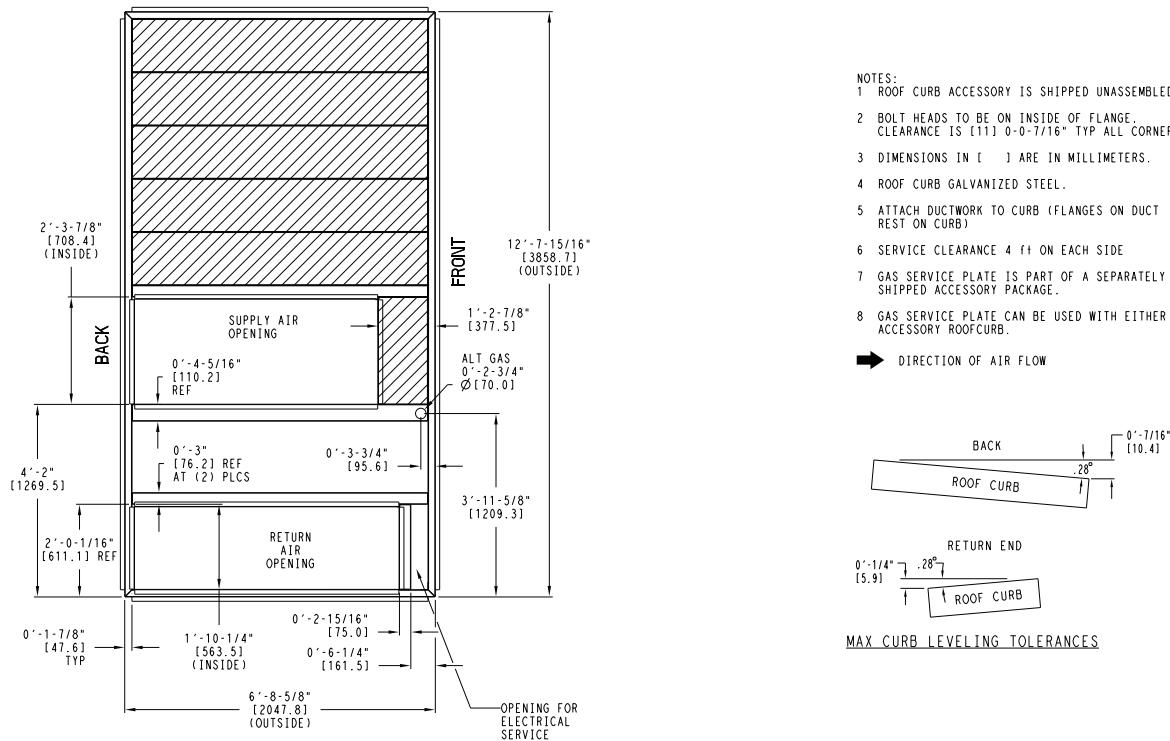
Roof Curb Details - 24 and 26 Size Units
